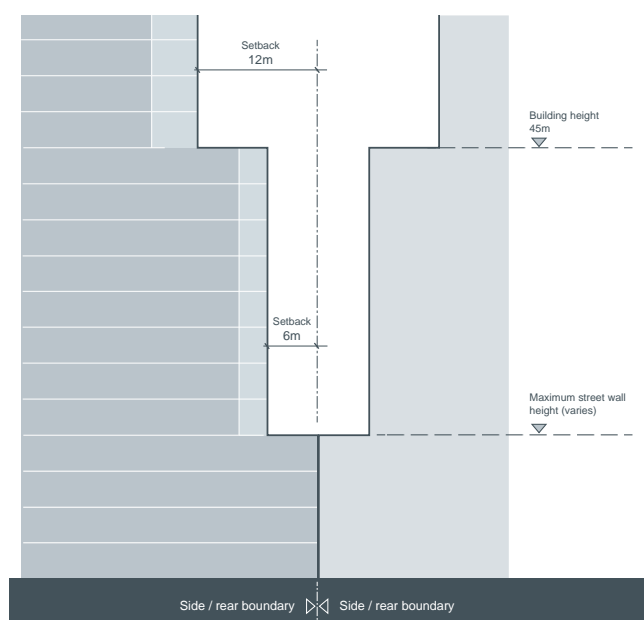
Section illustrating minimum side and rear setbacks for commercial buildings
